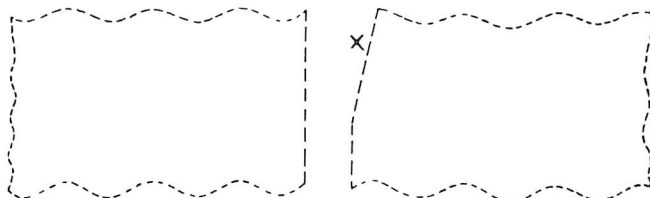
Showing mitre cut at top of sheets to take Outer Roll of ridging. Cut edge "X" of sheet fits against mitred edge "Y" of ridging.
